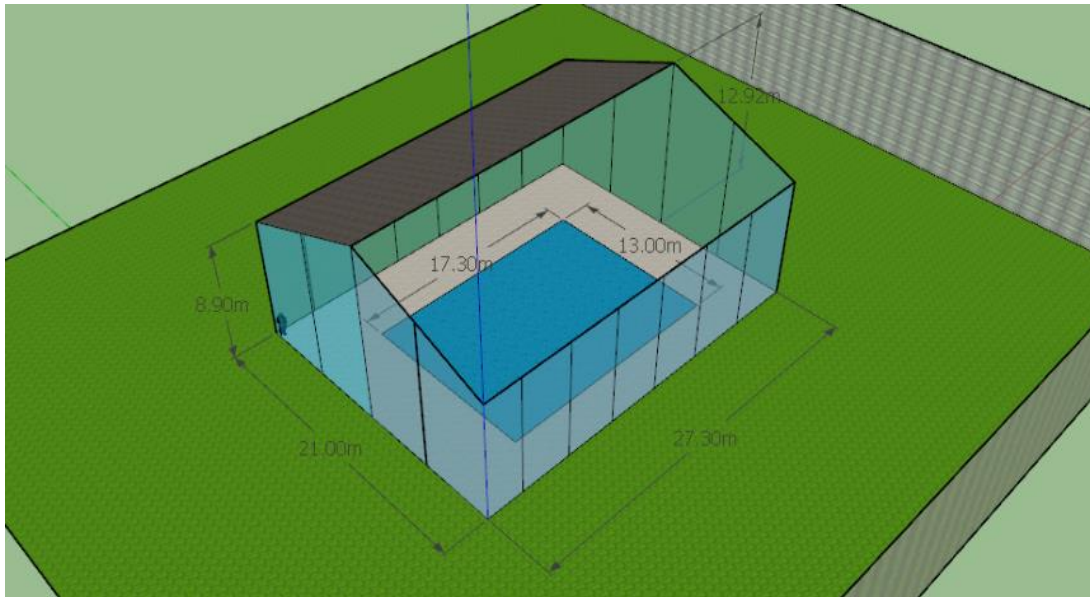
3D design with the dimensions of the hall and the swimming pool.
